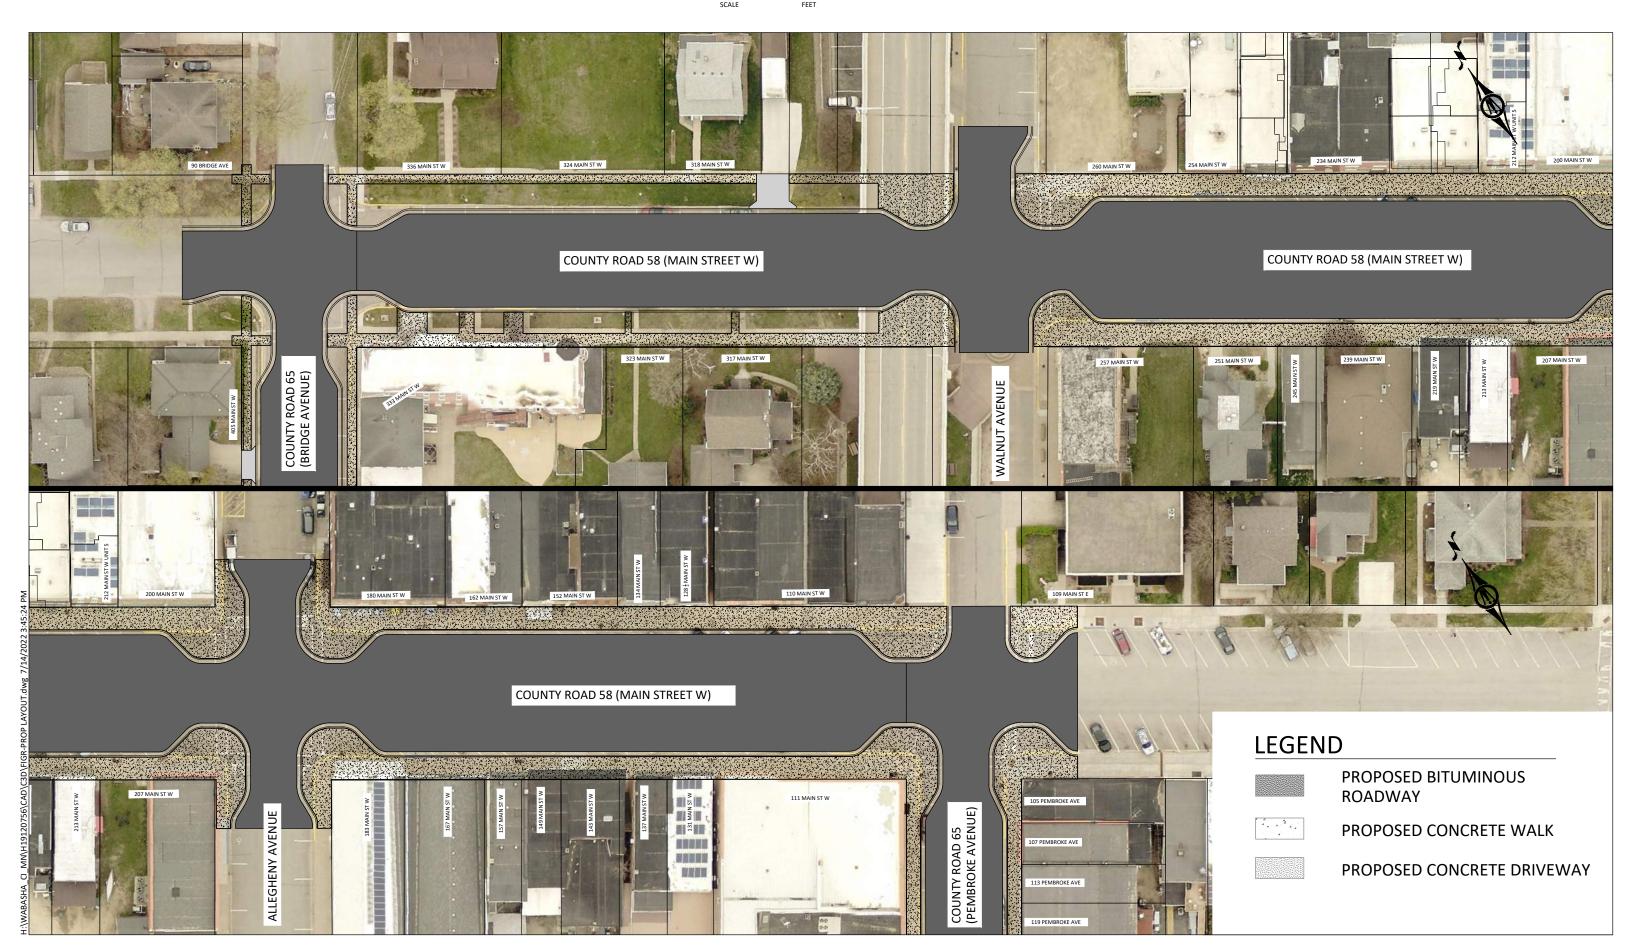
B: PROPOSED LAYOUT - MAIN STREET
